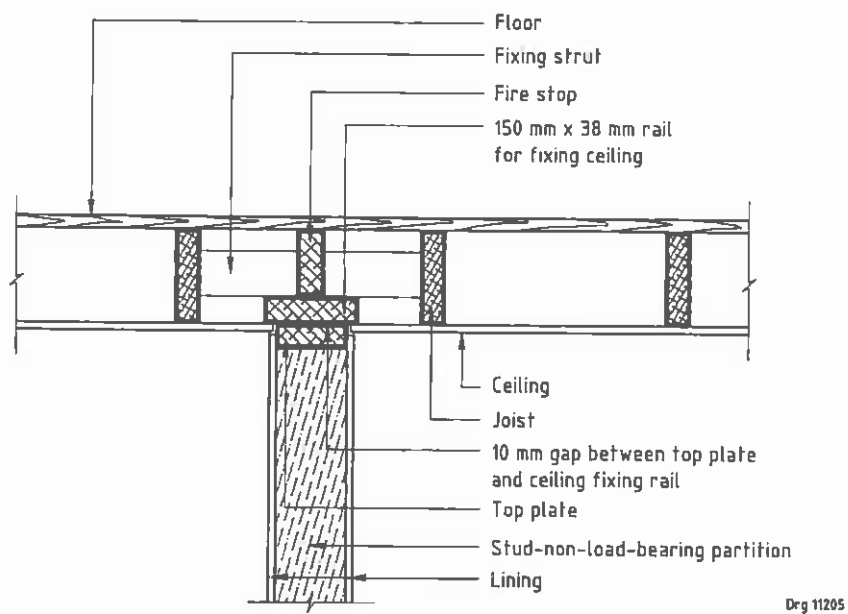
Attachment of non-load-bearing wall to first floor framing
